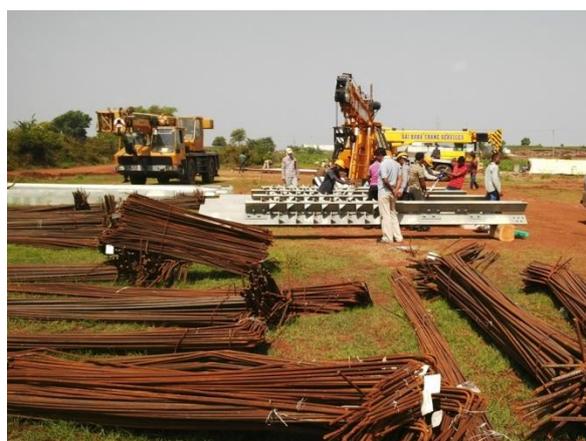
View of the construction activity for the foundation at NRB 14
